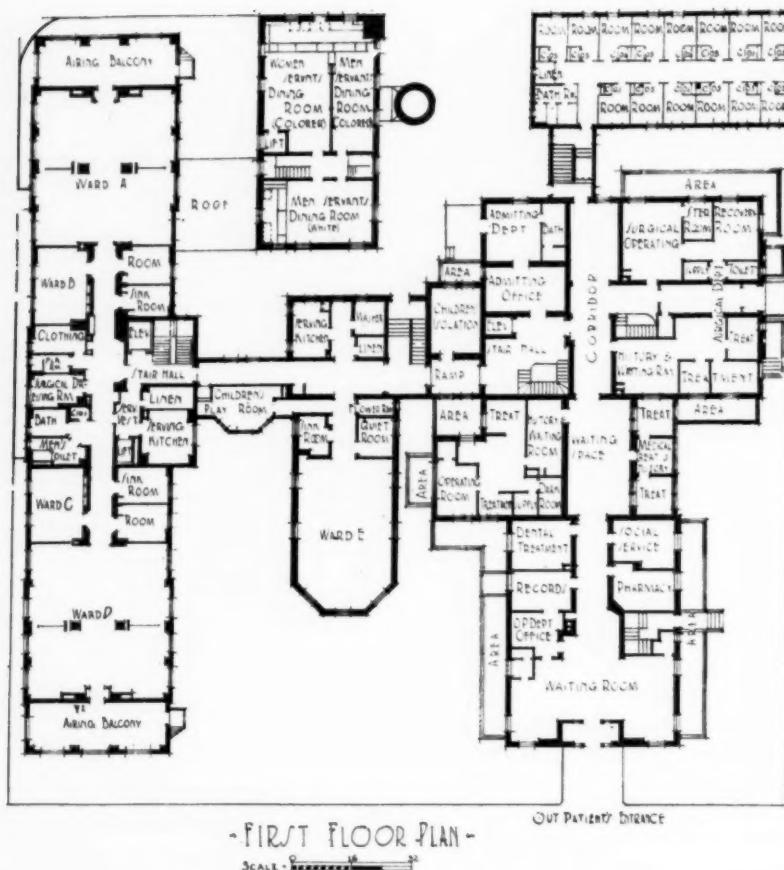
Harrisburg Hospital. Plan of first story, showing old and new portions.
